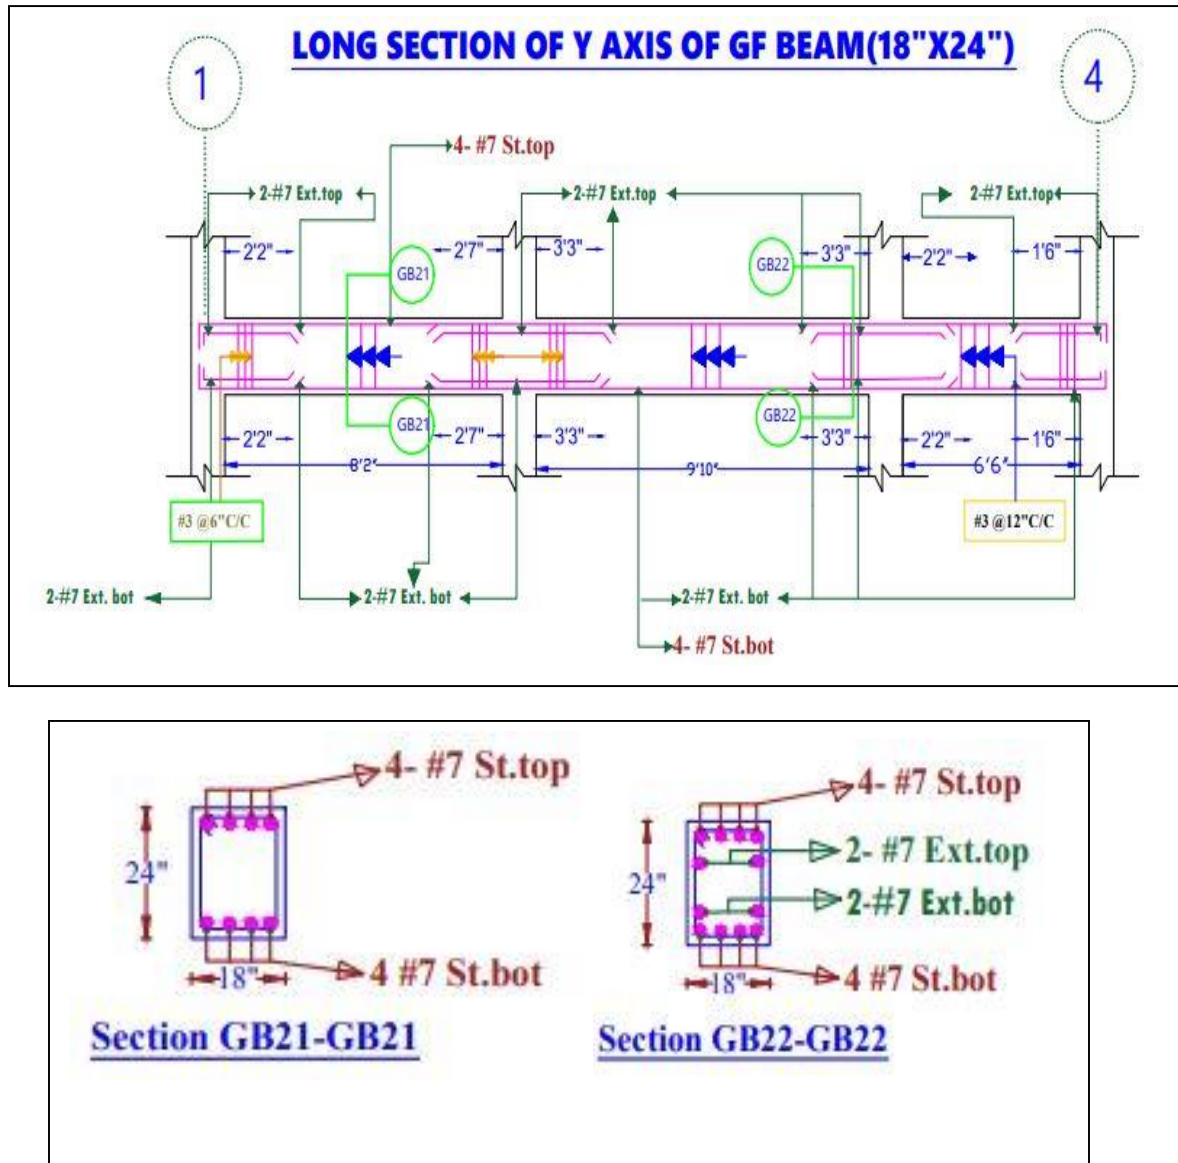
Beam Detailing & Cross Section of Y-axis
